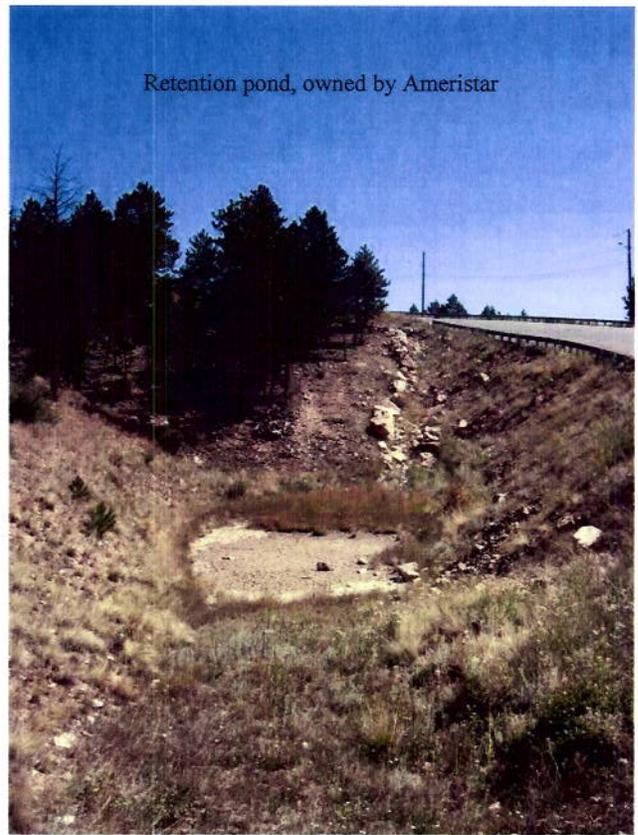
Retention pond located north of Avenue of All Stars, down-gradient of water tank construction
